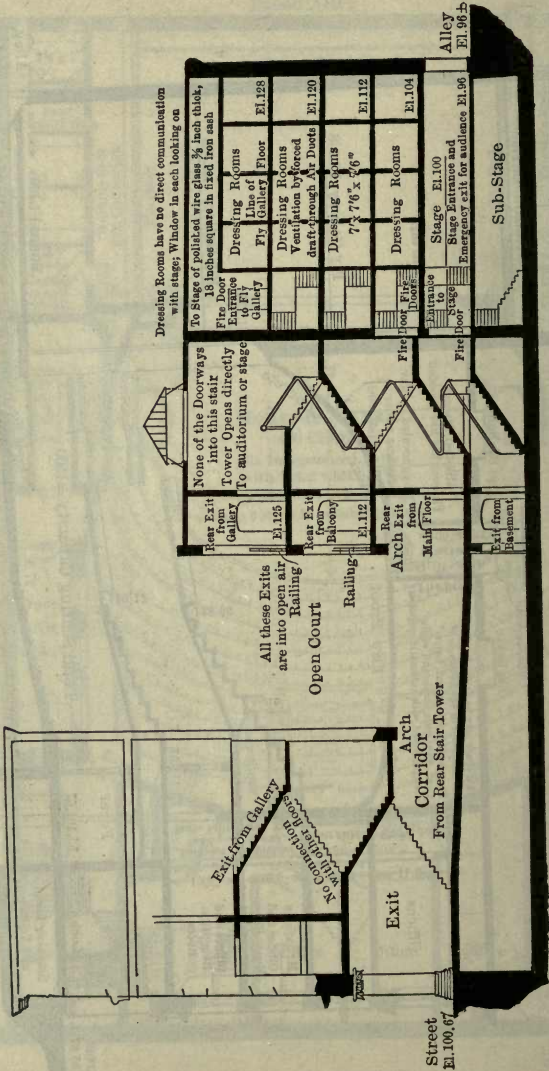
Section through Stair Tower, Model Theatre Design.
